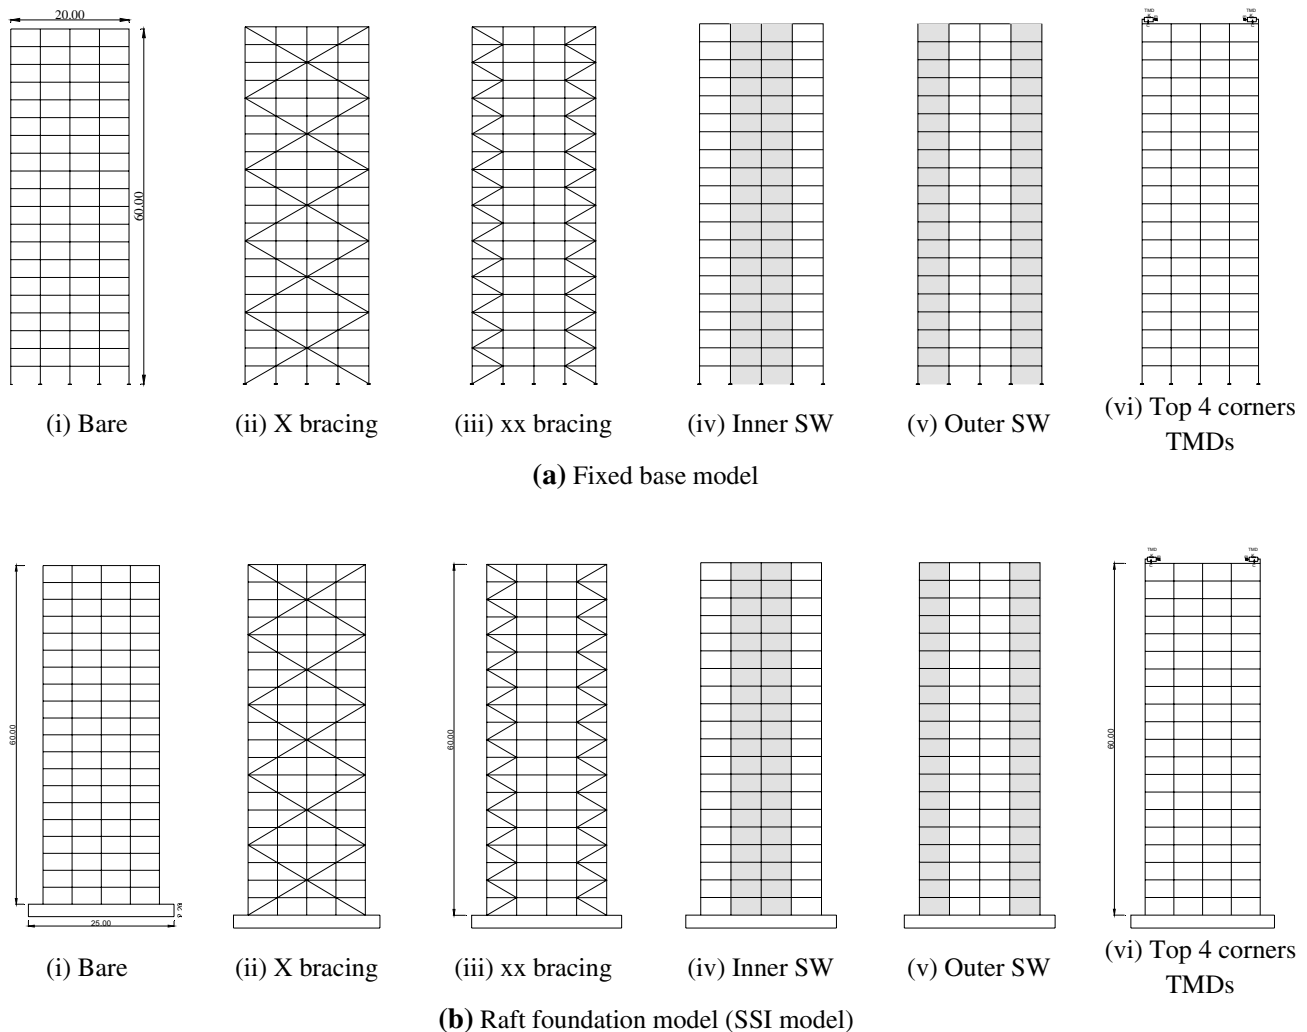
Front view of the 3D models of the reinforced concrete (RC) and steel HRBs
